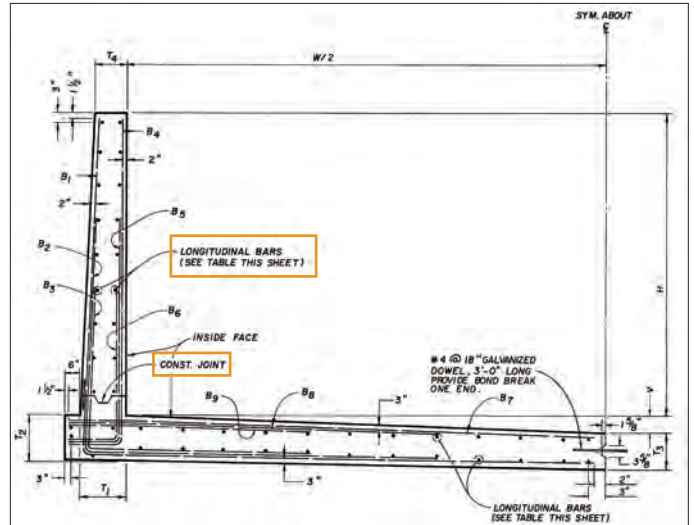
Typical cross section of a channel with two mats of reinforcement (Image courtesy of the Ventura County Public Works Agency—Water Protection)
